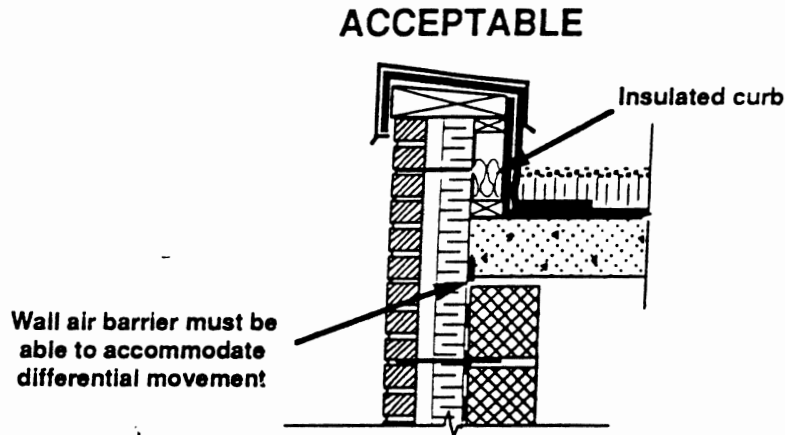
Masonry Wall/Roof Edge - Concrete Frame (Brand)
